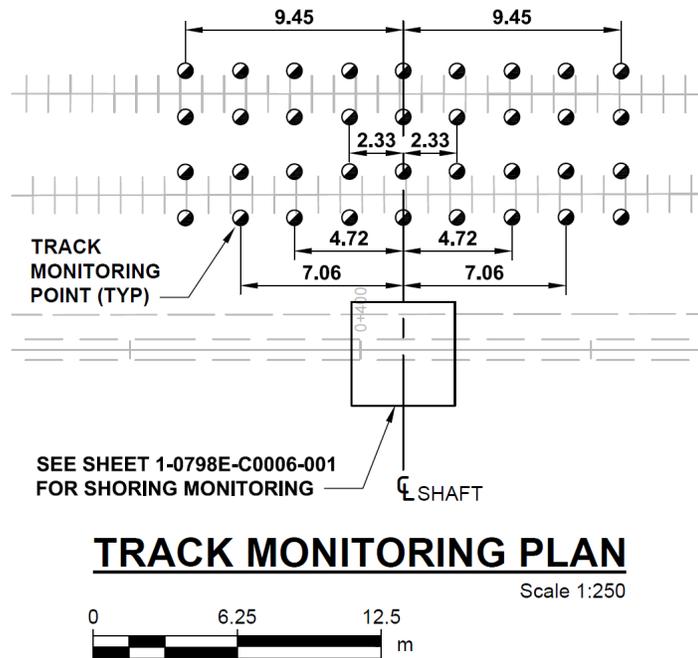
Proposed Layout of Surface Settlement Monitoring Points for Rail Track
